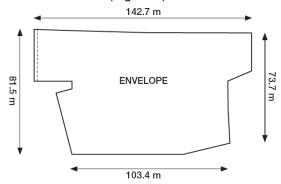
Block B site boundary Source: Woods Bagot & SOM architects
